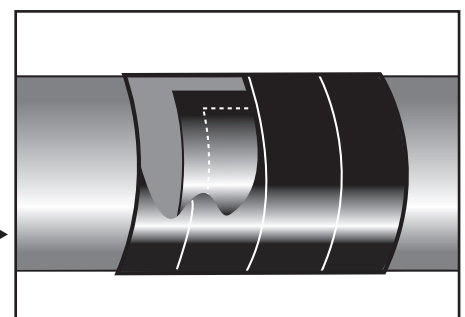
Repair damaged area with a patch of tape overlapping at least 25mm onto primed sound coating area before wrapping with tape as for Butt Weld Joints.
